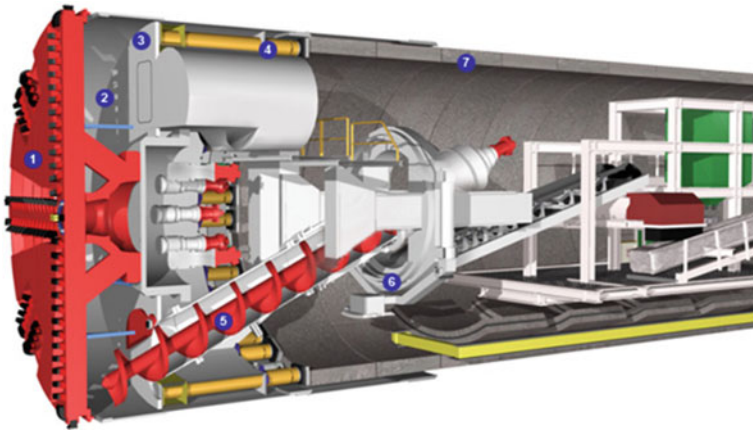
How an EPBS-TBM works (Herrenknecht website): 1 cutting wheel, 2 excavation chamber, 3 pressure bulkhead, 4 hydraulic thrust cylinders, 5 auger conveyor, 6 erectors, 7 lining segments
